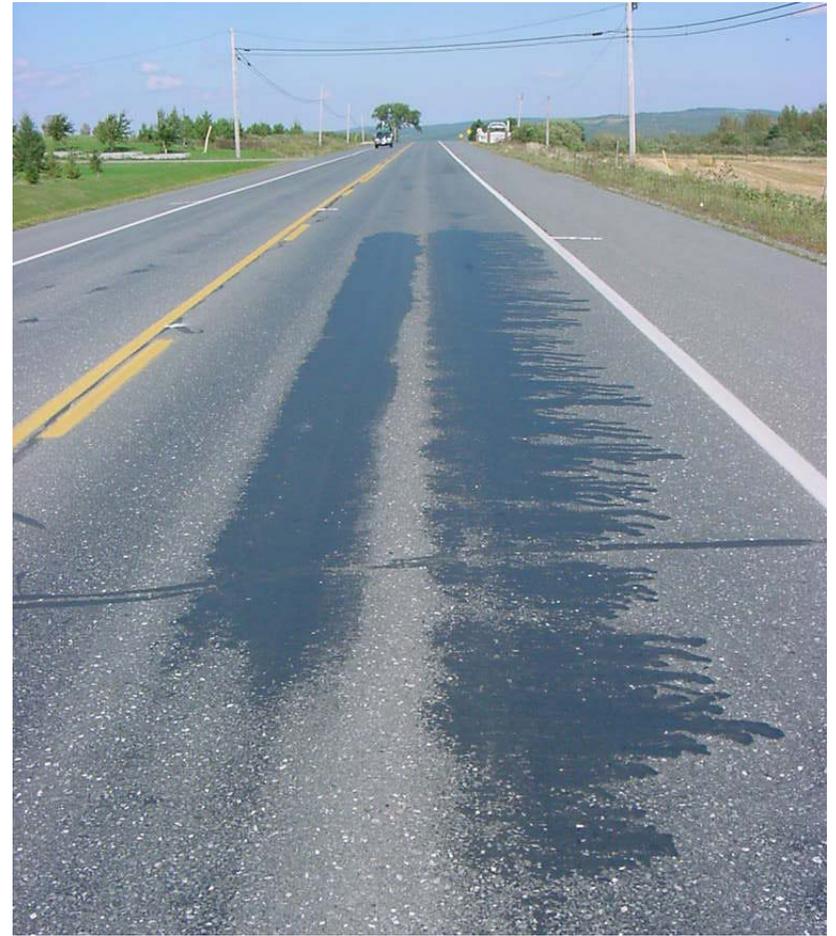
2002, Asphalt Stabilized Section, Asphalt Flushed Area
